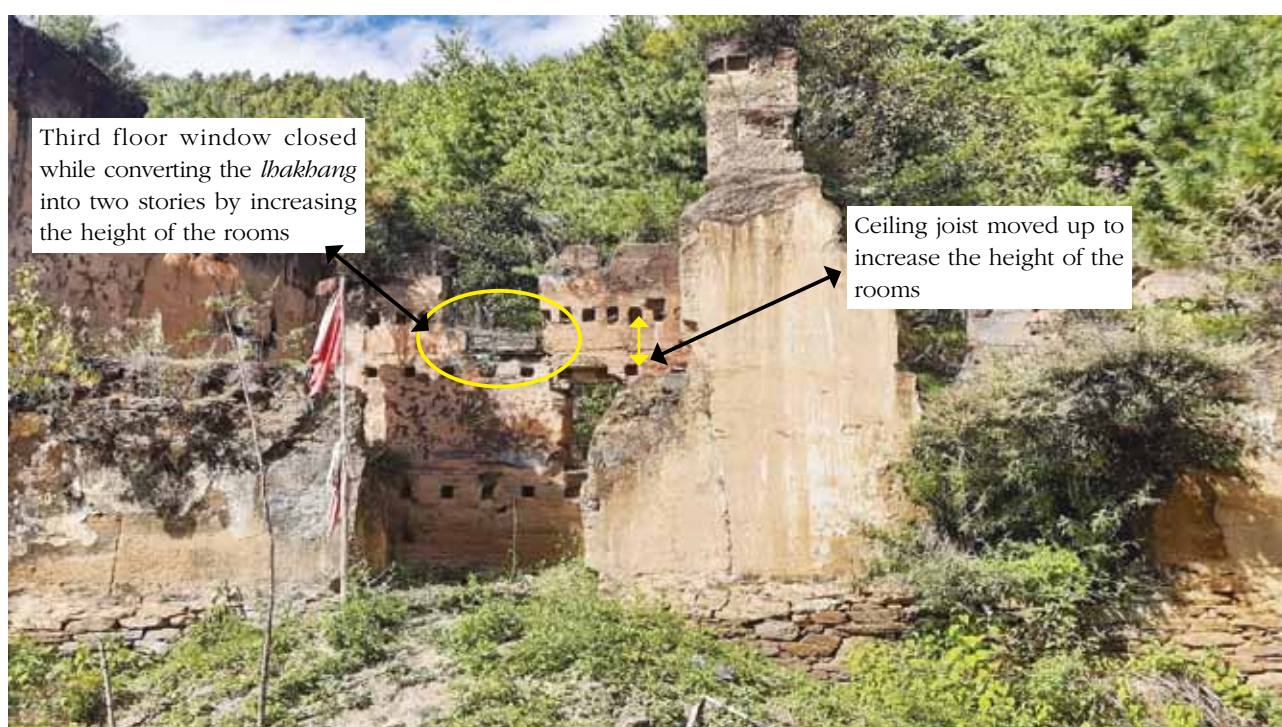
Photo showing evidence of a ceiling joist being shifted and window of the third floor being closed during reconstruction after an earthquake in 1909.
